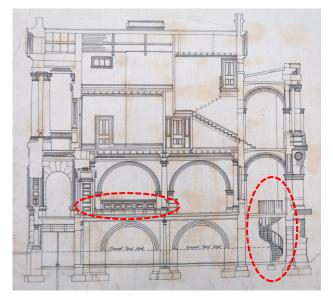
Section A-B (generally as constructed) showing view south, through the centre of the Link Building (features visible include spiral staircase in rear arcade which is now removed and timber counter on ground floor, also removed)
